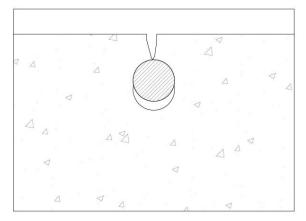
Schematic showing effect of supported bar in causing cracking in the concrete surface over the bar due to concrete settlement. Note potential notch effect and void under bar that may promote further cracking due to drying or thermal contraction.
